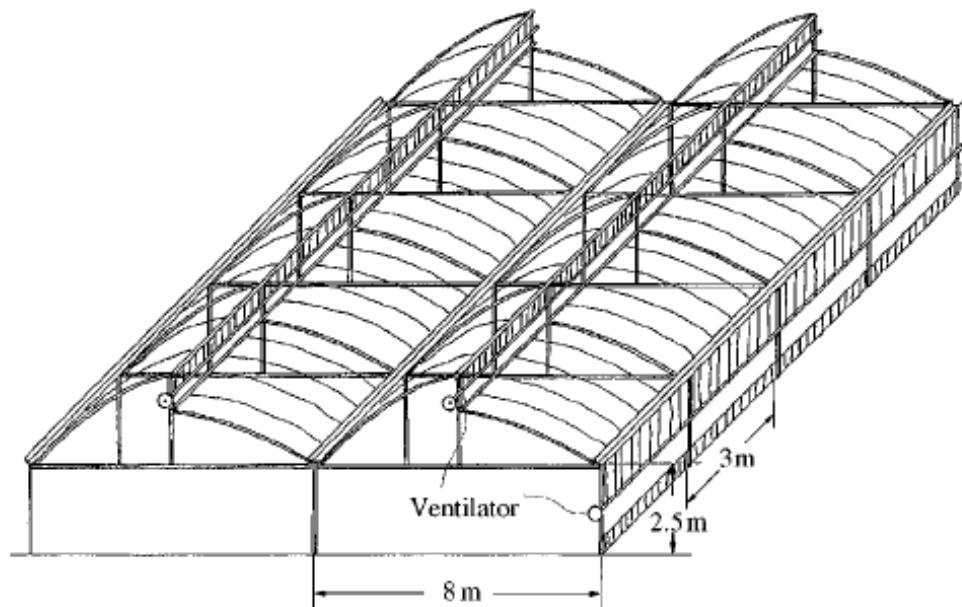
Plastic covered greenhouse with ridge and sidewall ventilation
